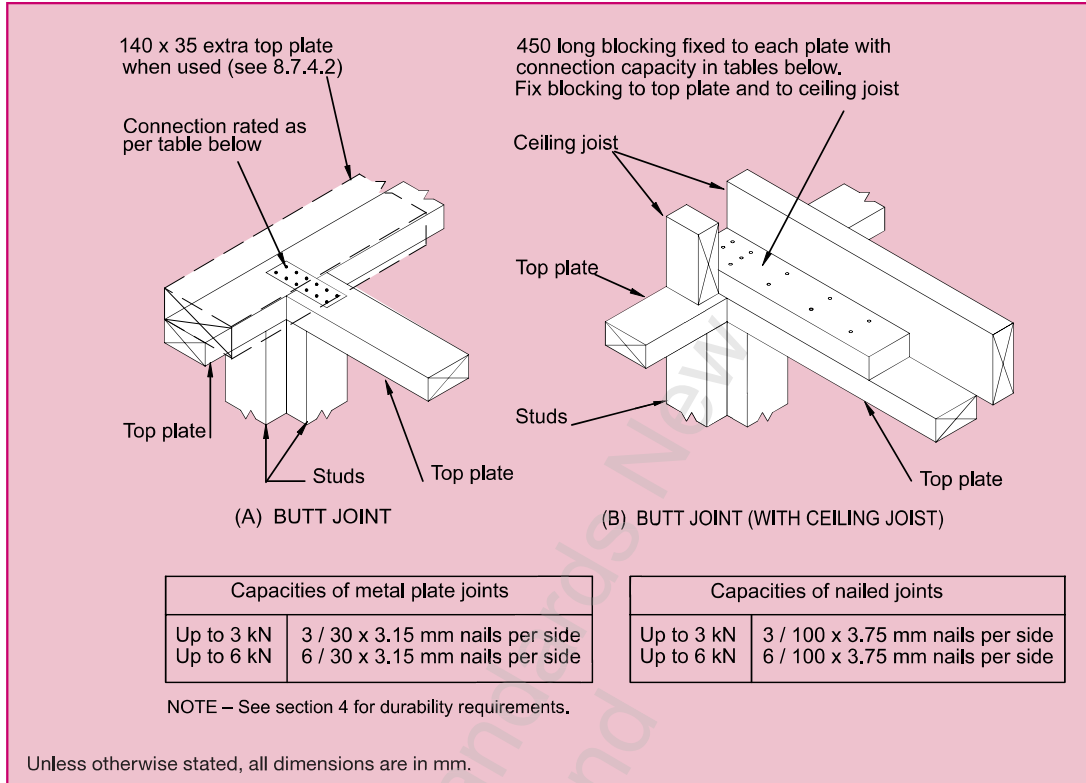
Connecting top plates to external walls at right angles – Walls containing bracing (see 8.7.3.4)
